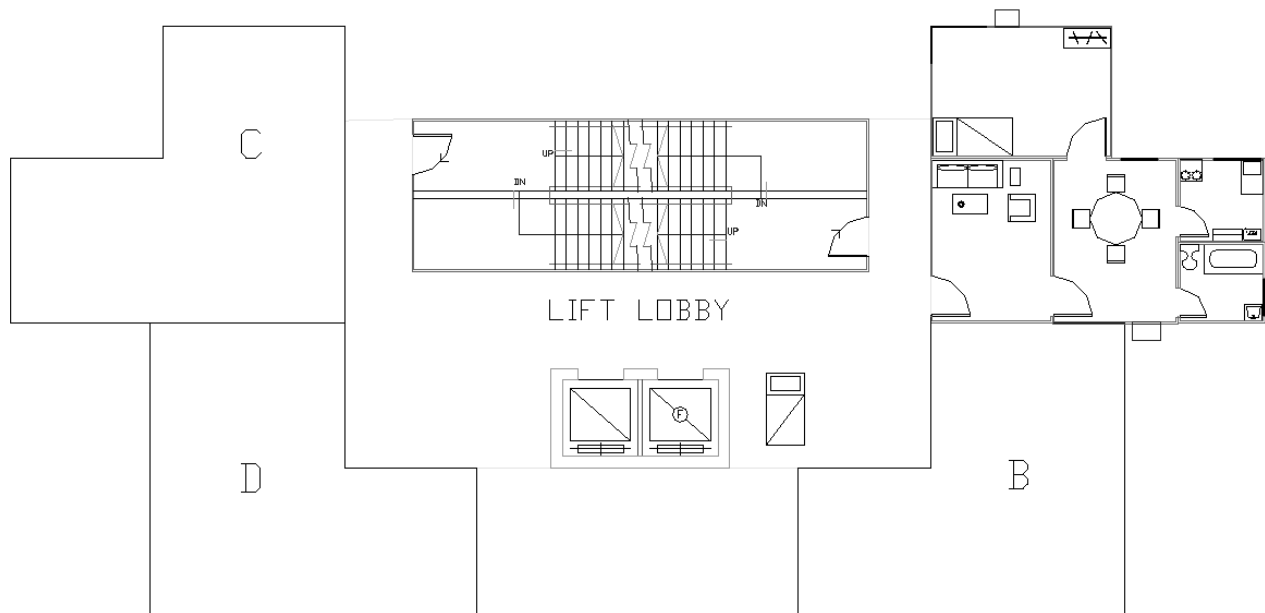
Typical floor plan analyzed by the FPDx critic module.
